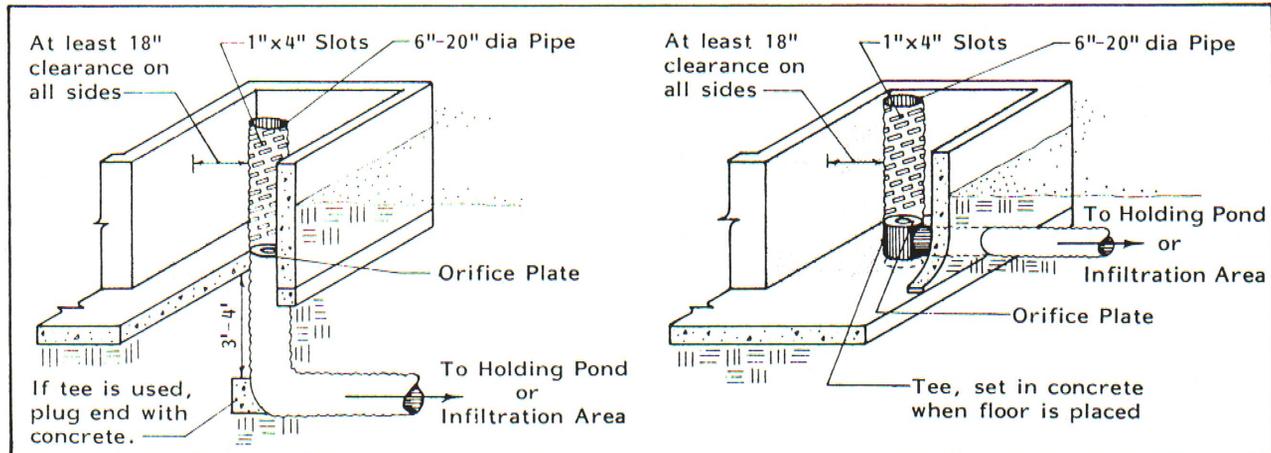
Riser pipe outlets for settling basins. See Midwest Plan Service publication MWPS-18 for design detail for the risers. Reproduced with permission from: *Livestock Waste Facilities Handbook*, MWPS-18, 2nd Edition, 1985(c) Midwest Plan Service, Ames, IA 50011-3080.
